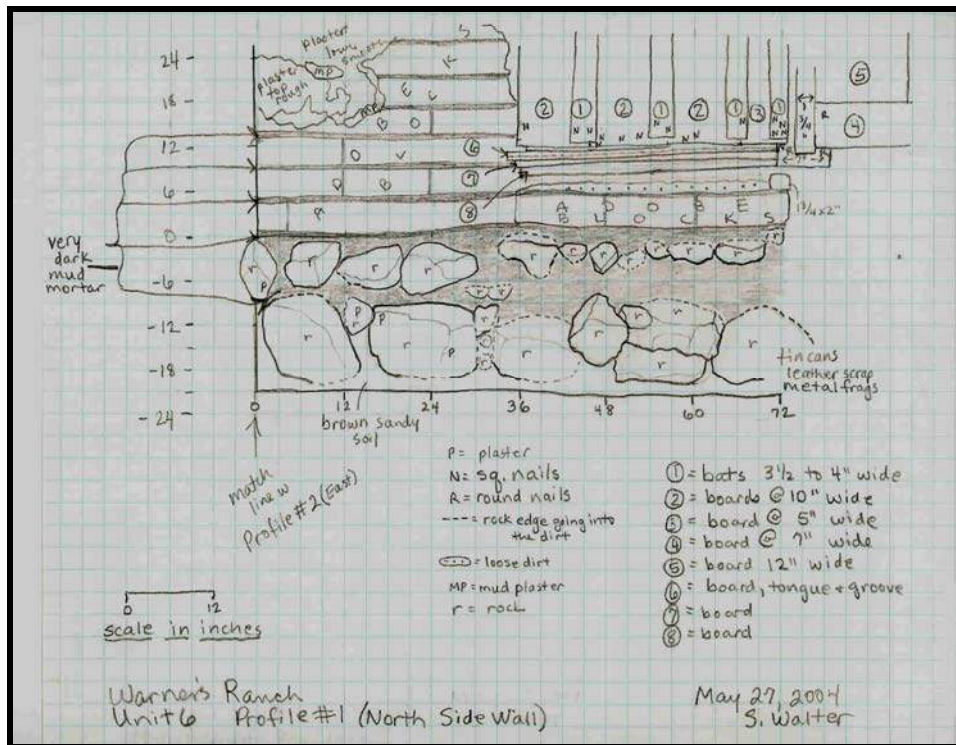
Unit 04-6 south sidewall profile sketch of the stone foundation and adobe block under the wooden infill on the north wall of Room 107.
